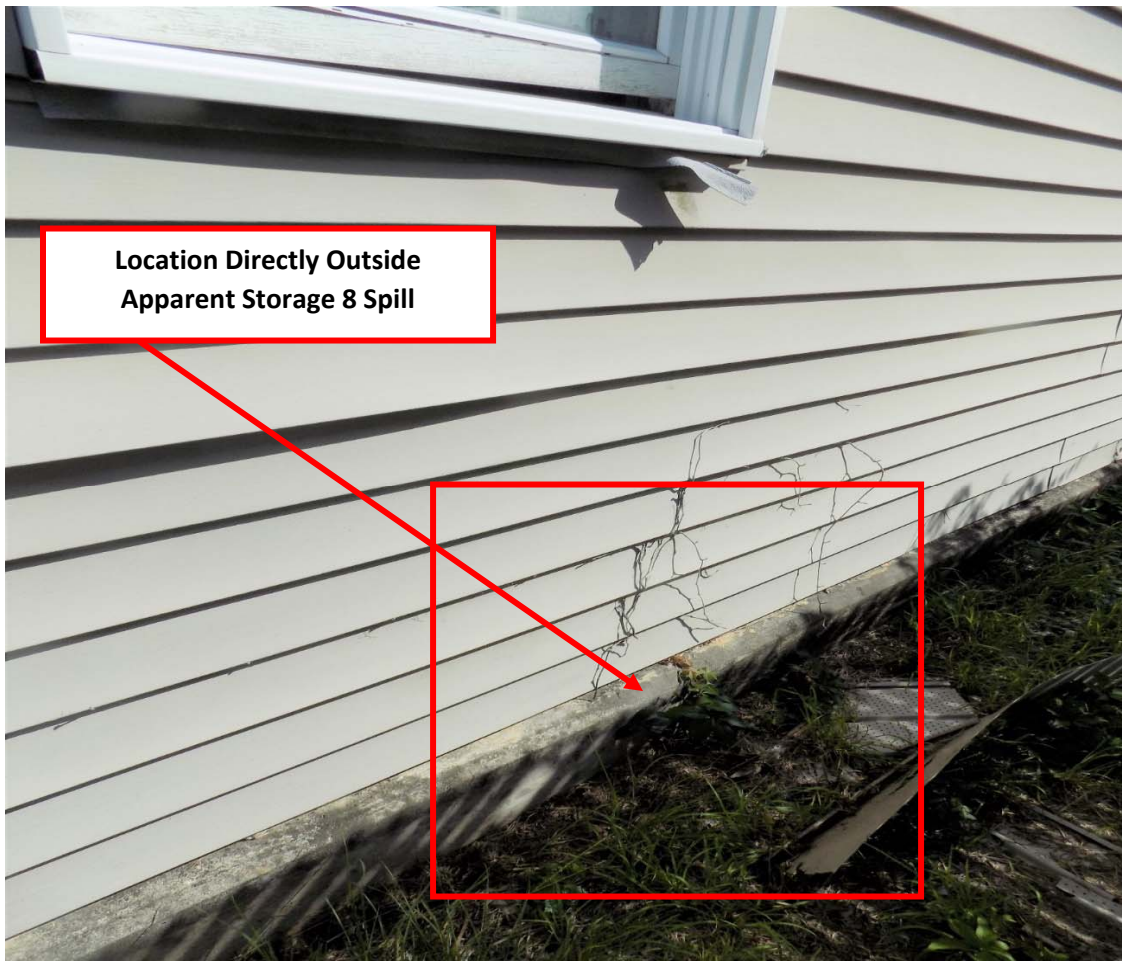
B: 710-16D Opposite Side Of Wall From Storage 8 Spill Looking Northeast
